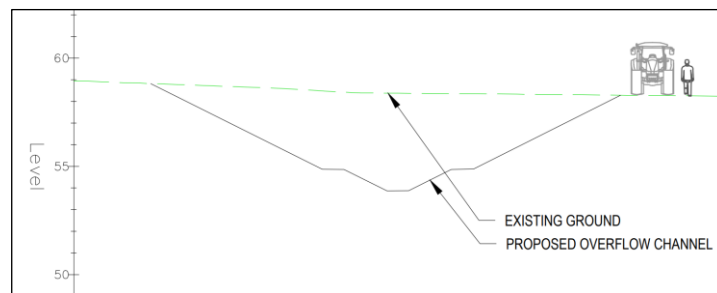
Concept Cross Section in deep cut section showing existing and proposed levels
